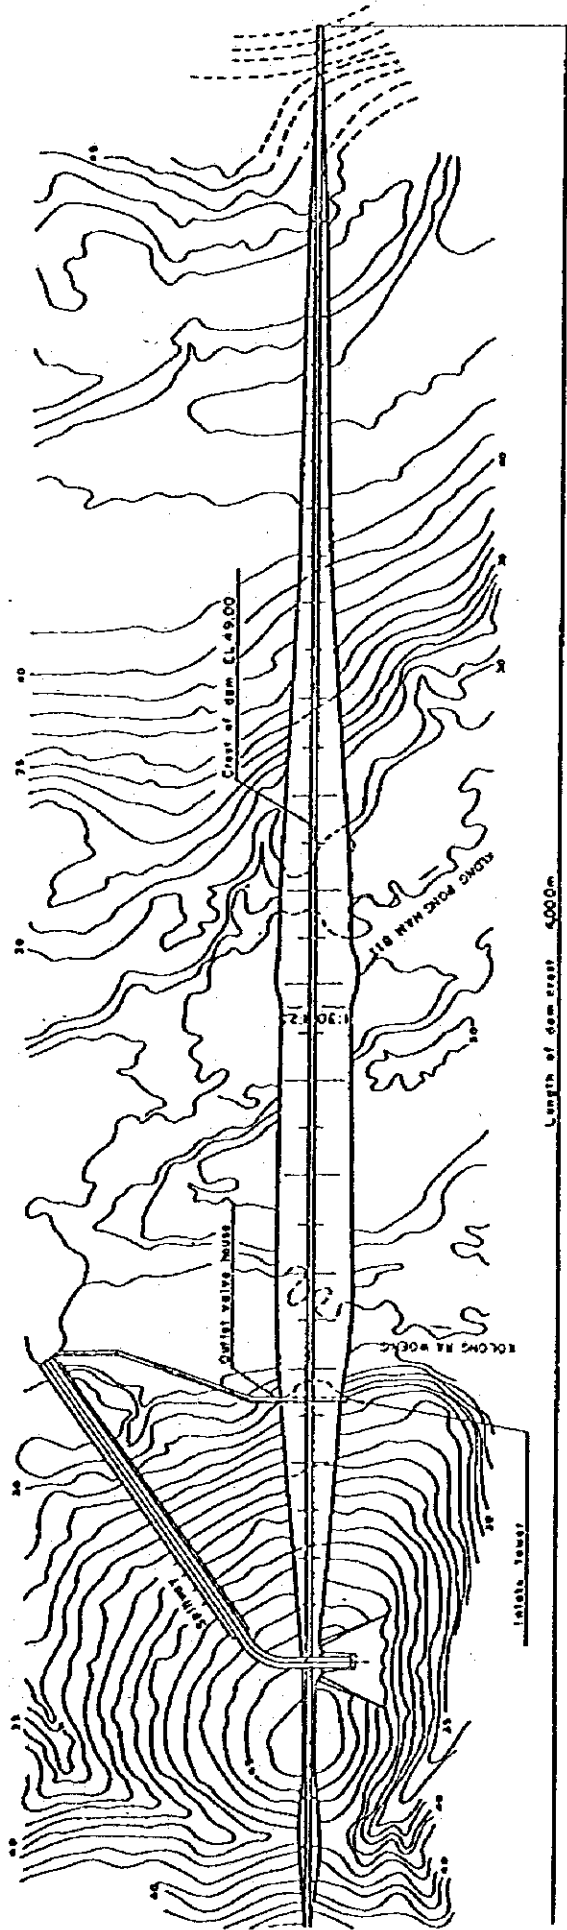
Longitudinal Profile of Nong Pla Lai Dam
